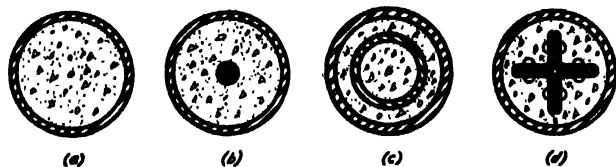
TYPES OF CONCRETE FILLED COLUMNS
